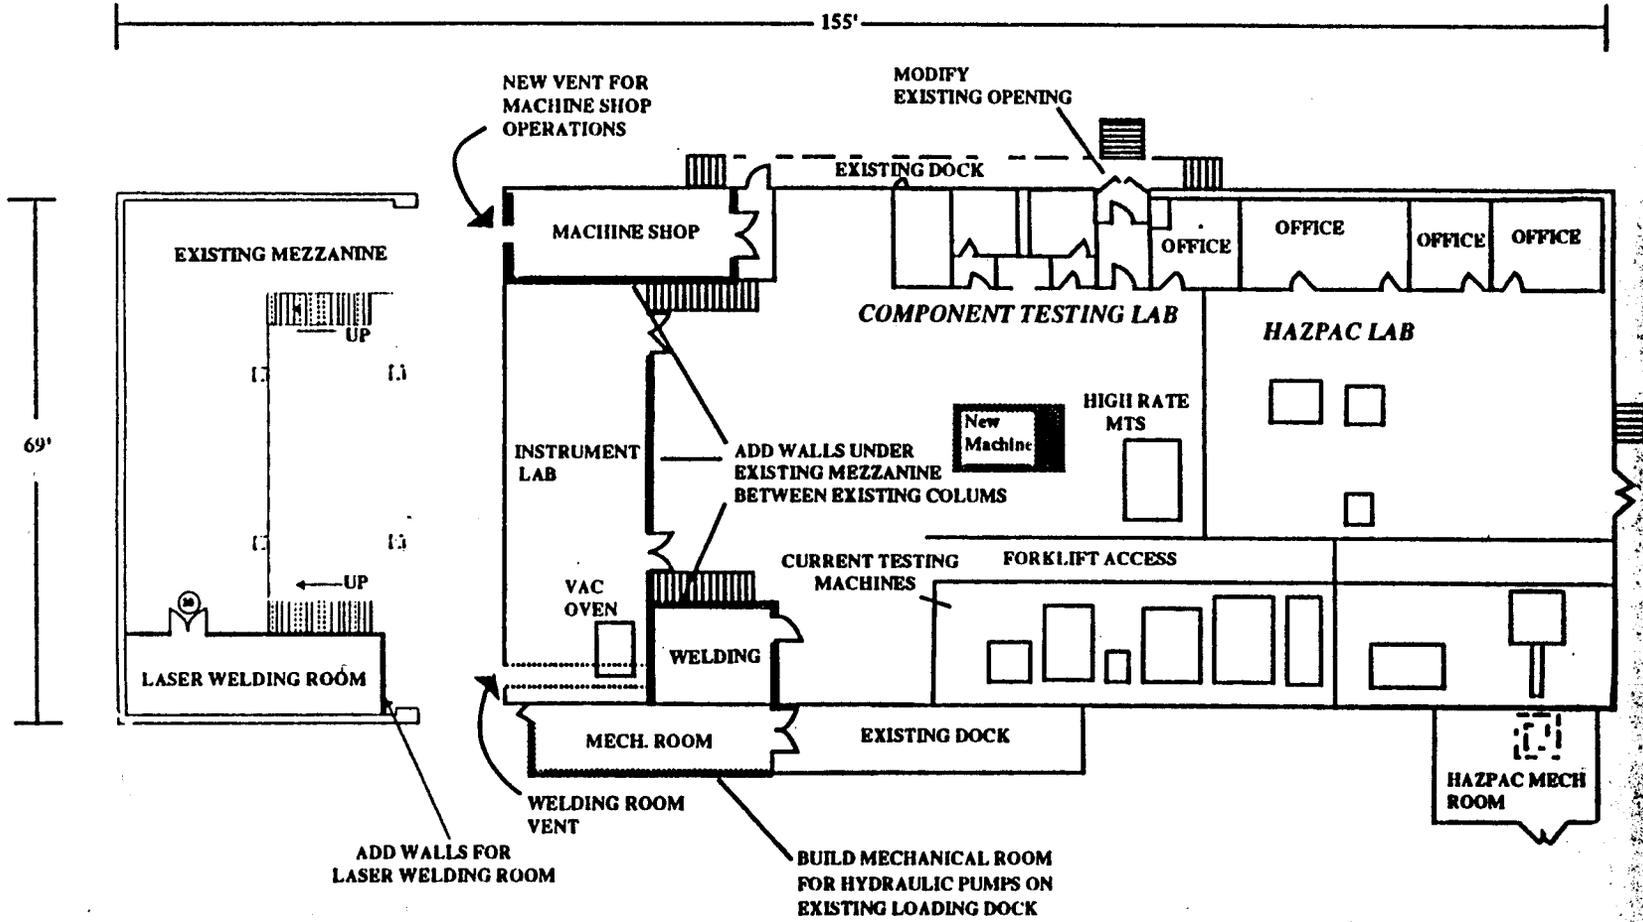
Floor Plan of Building 207 with Proposed Modifications
